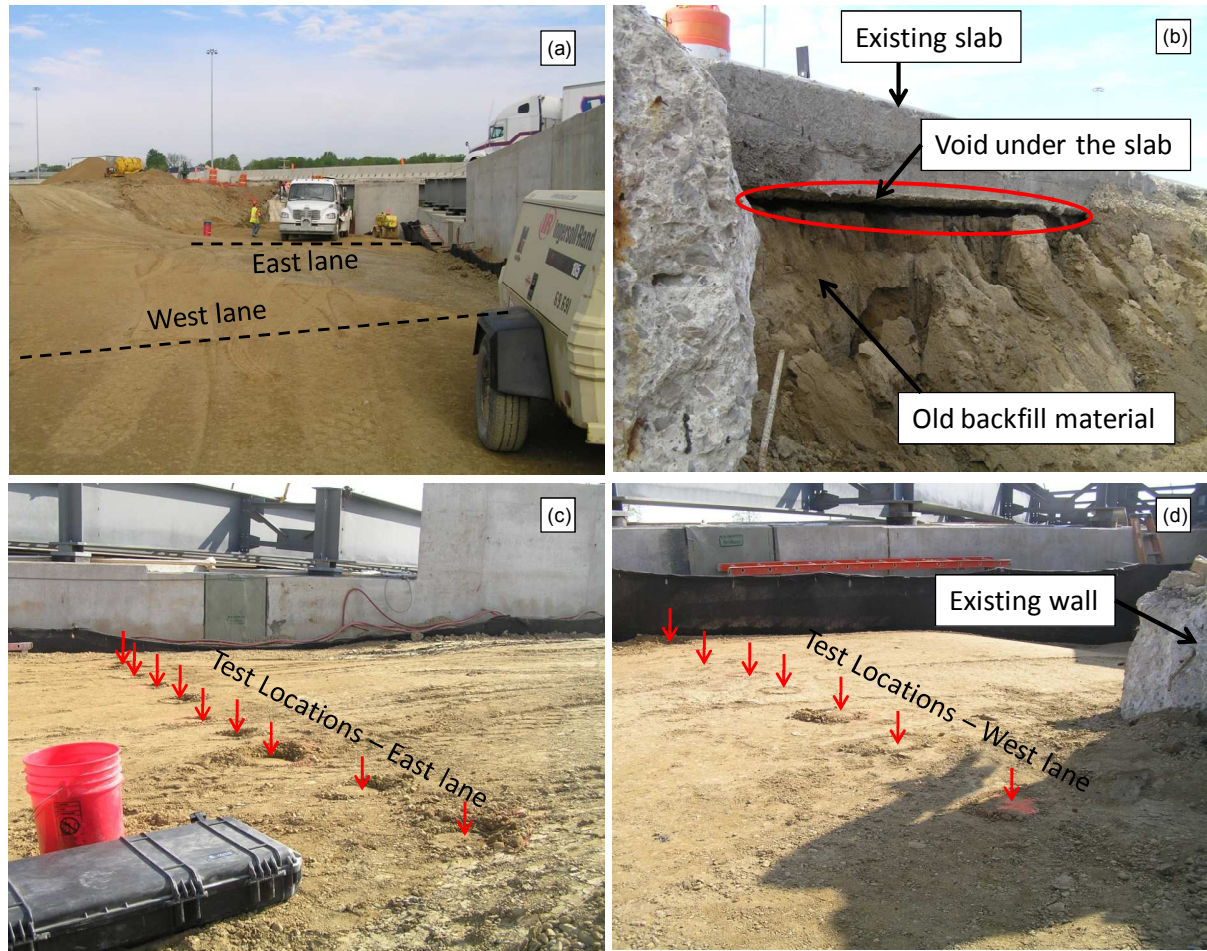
Bridge #6 (MED-71-0729) at I-71 and I-76 interchange: (a) location of test site; (b) void under the existing slab and old backfill material (c) in situ test locations – east lane (d) in situ test locations – west lane
